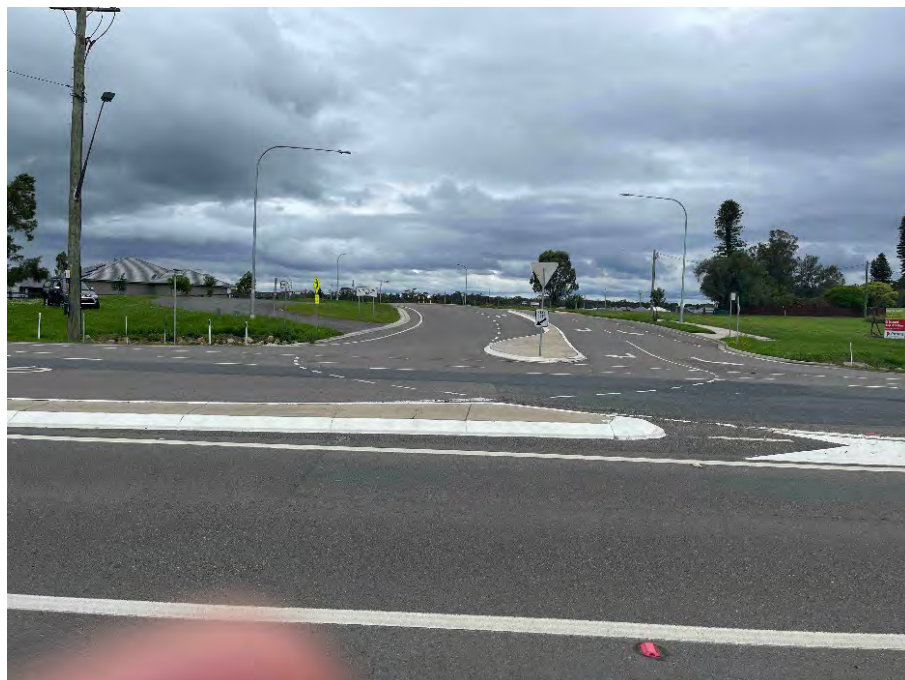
Terriere Drive, looking south from the intersection with the New England Hwy
